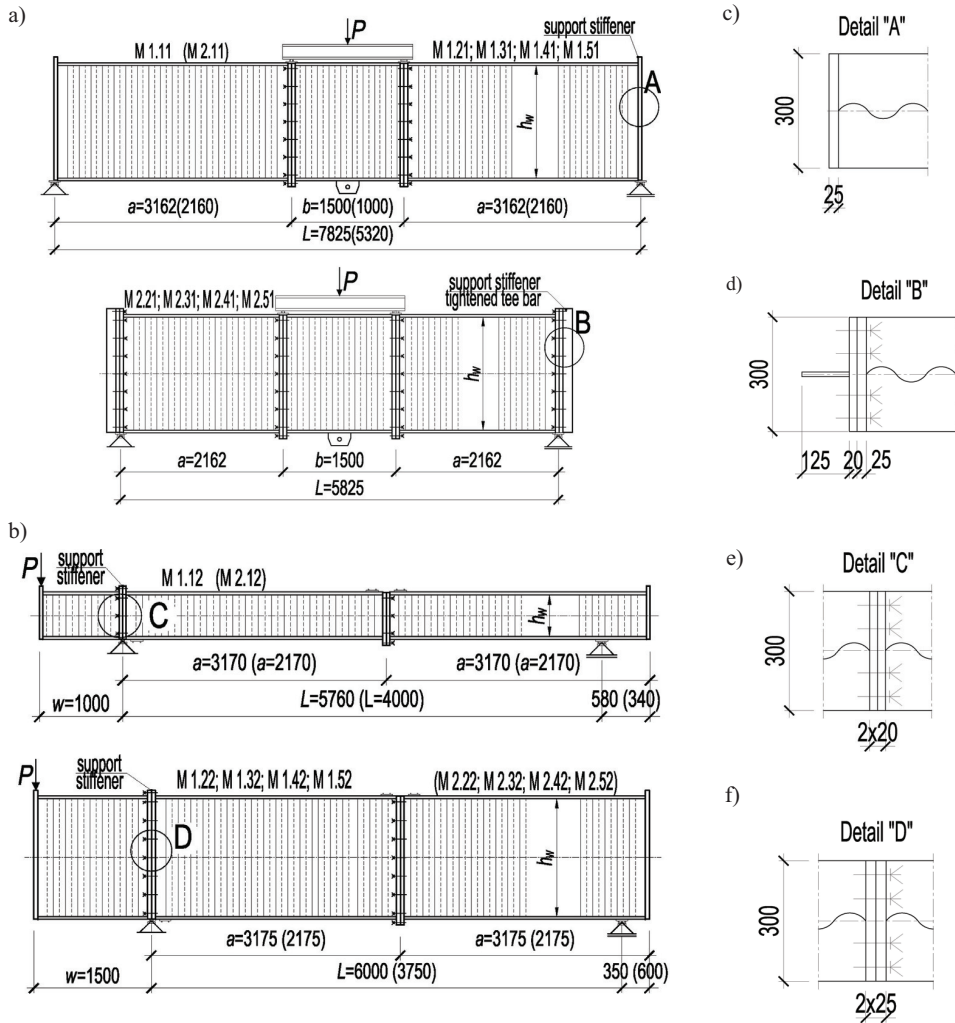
Girders with corrugated web: a) beam girders b) cantilever girders; c) d) e) f) support stiffeners
